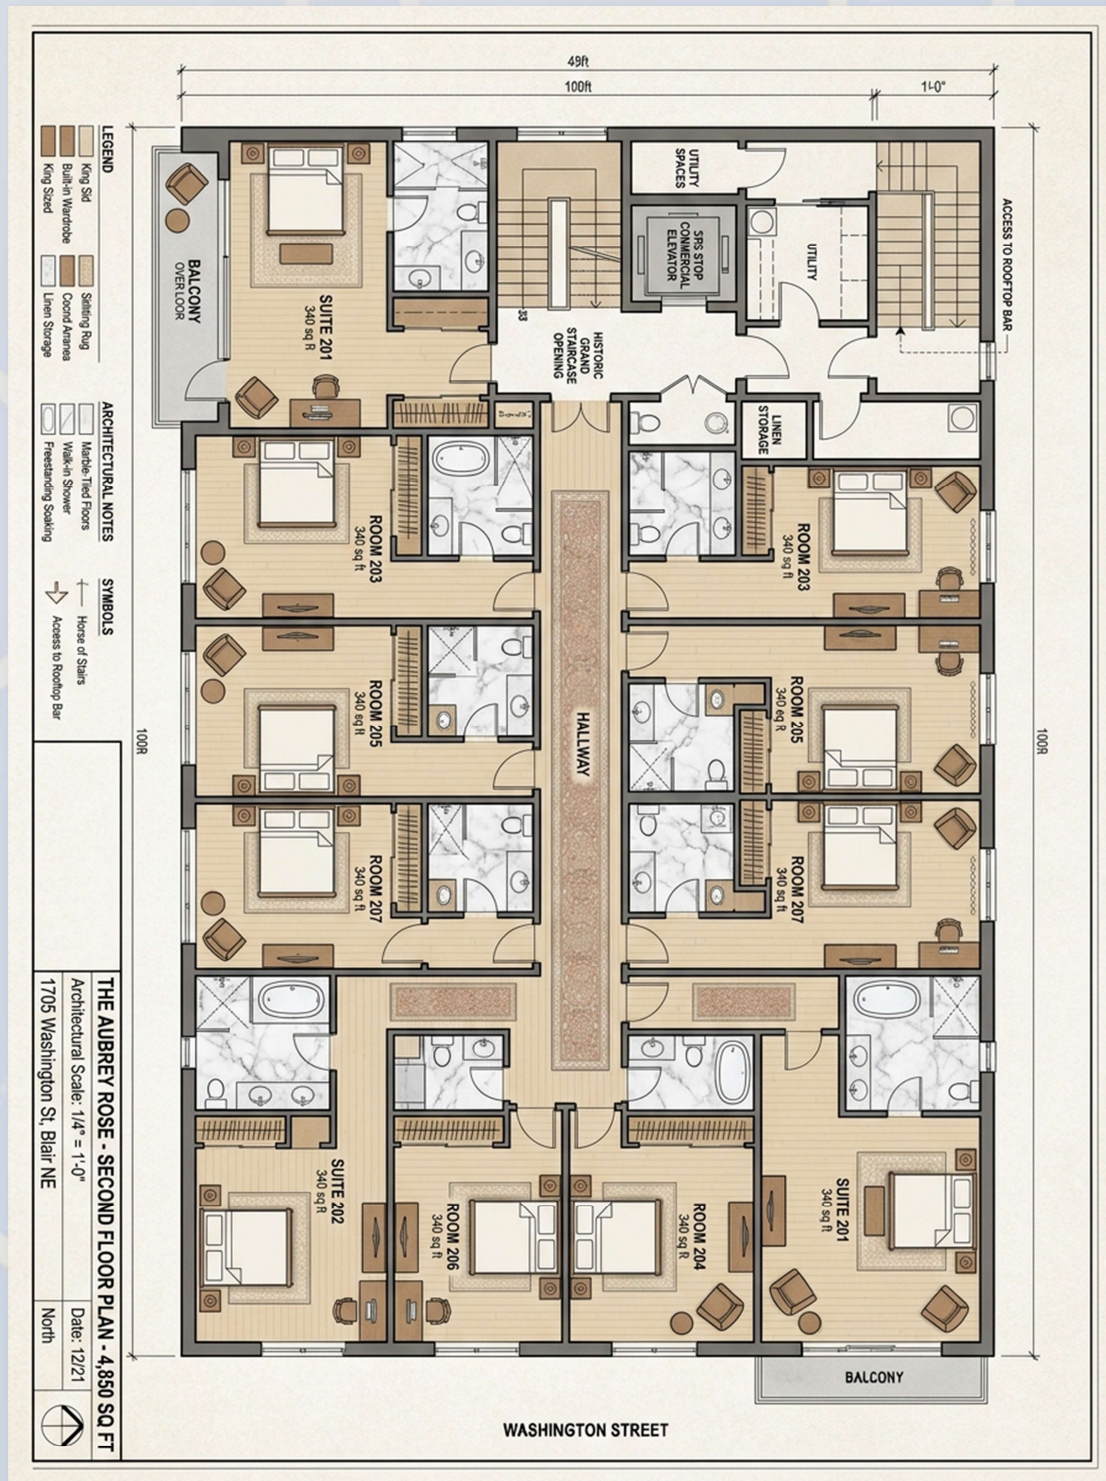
Example Architectural Site Plan & Layout — Second Floor Upper Level (4,850 SF)
